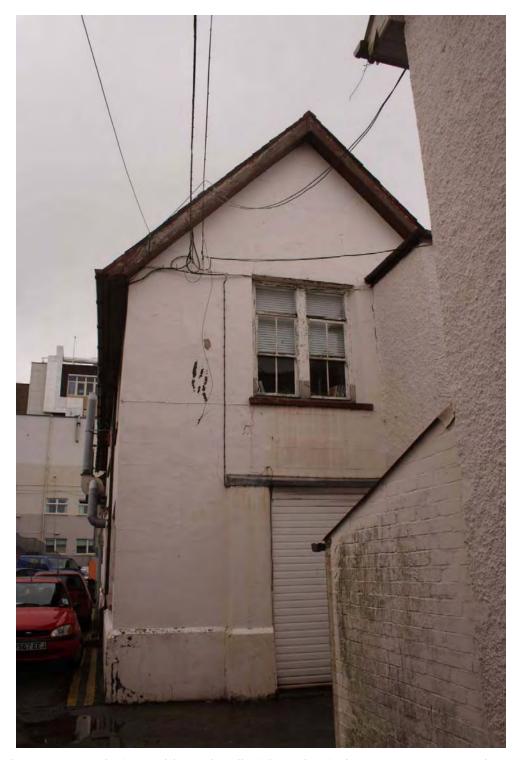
West facing gable end wall with sash window upper storey and new roller shutter door to ground floor
